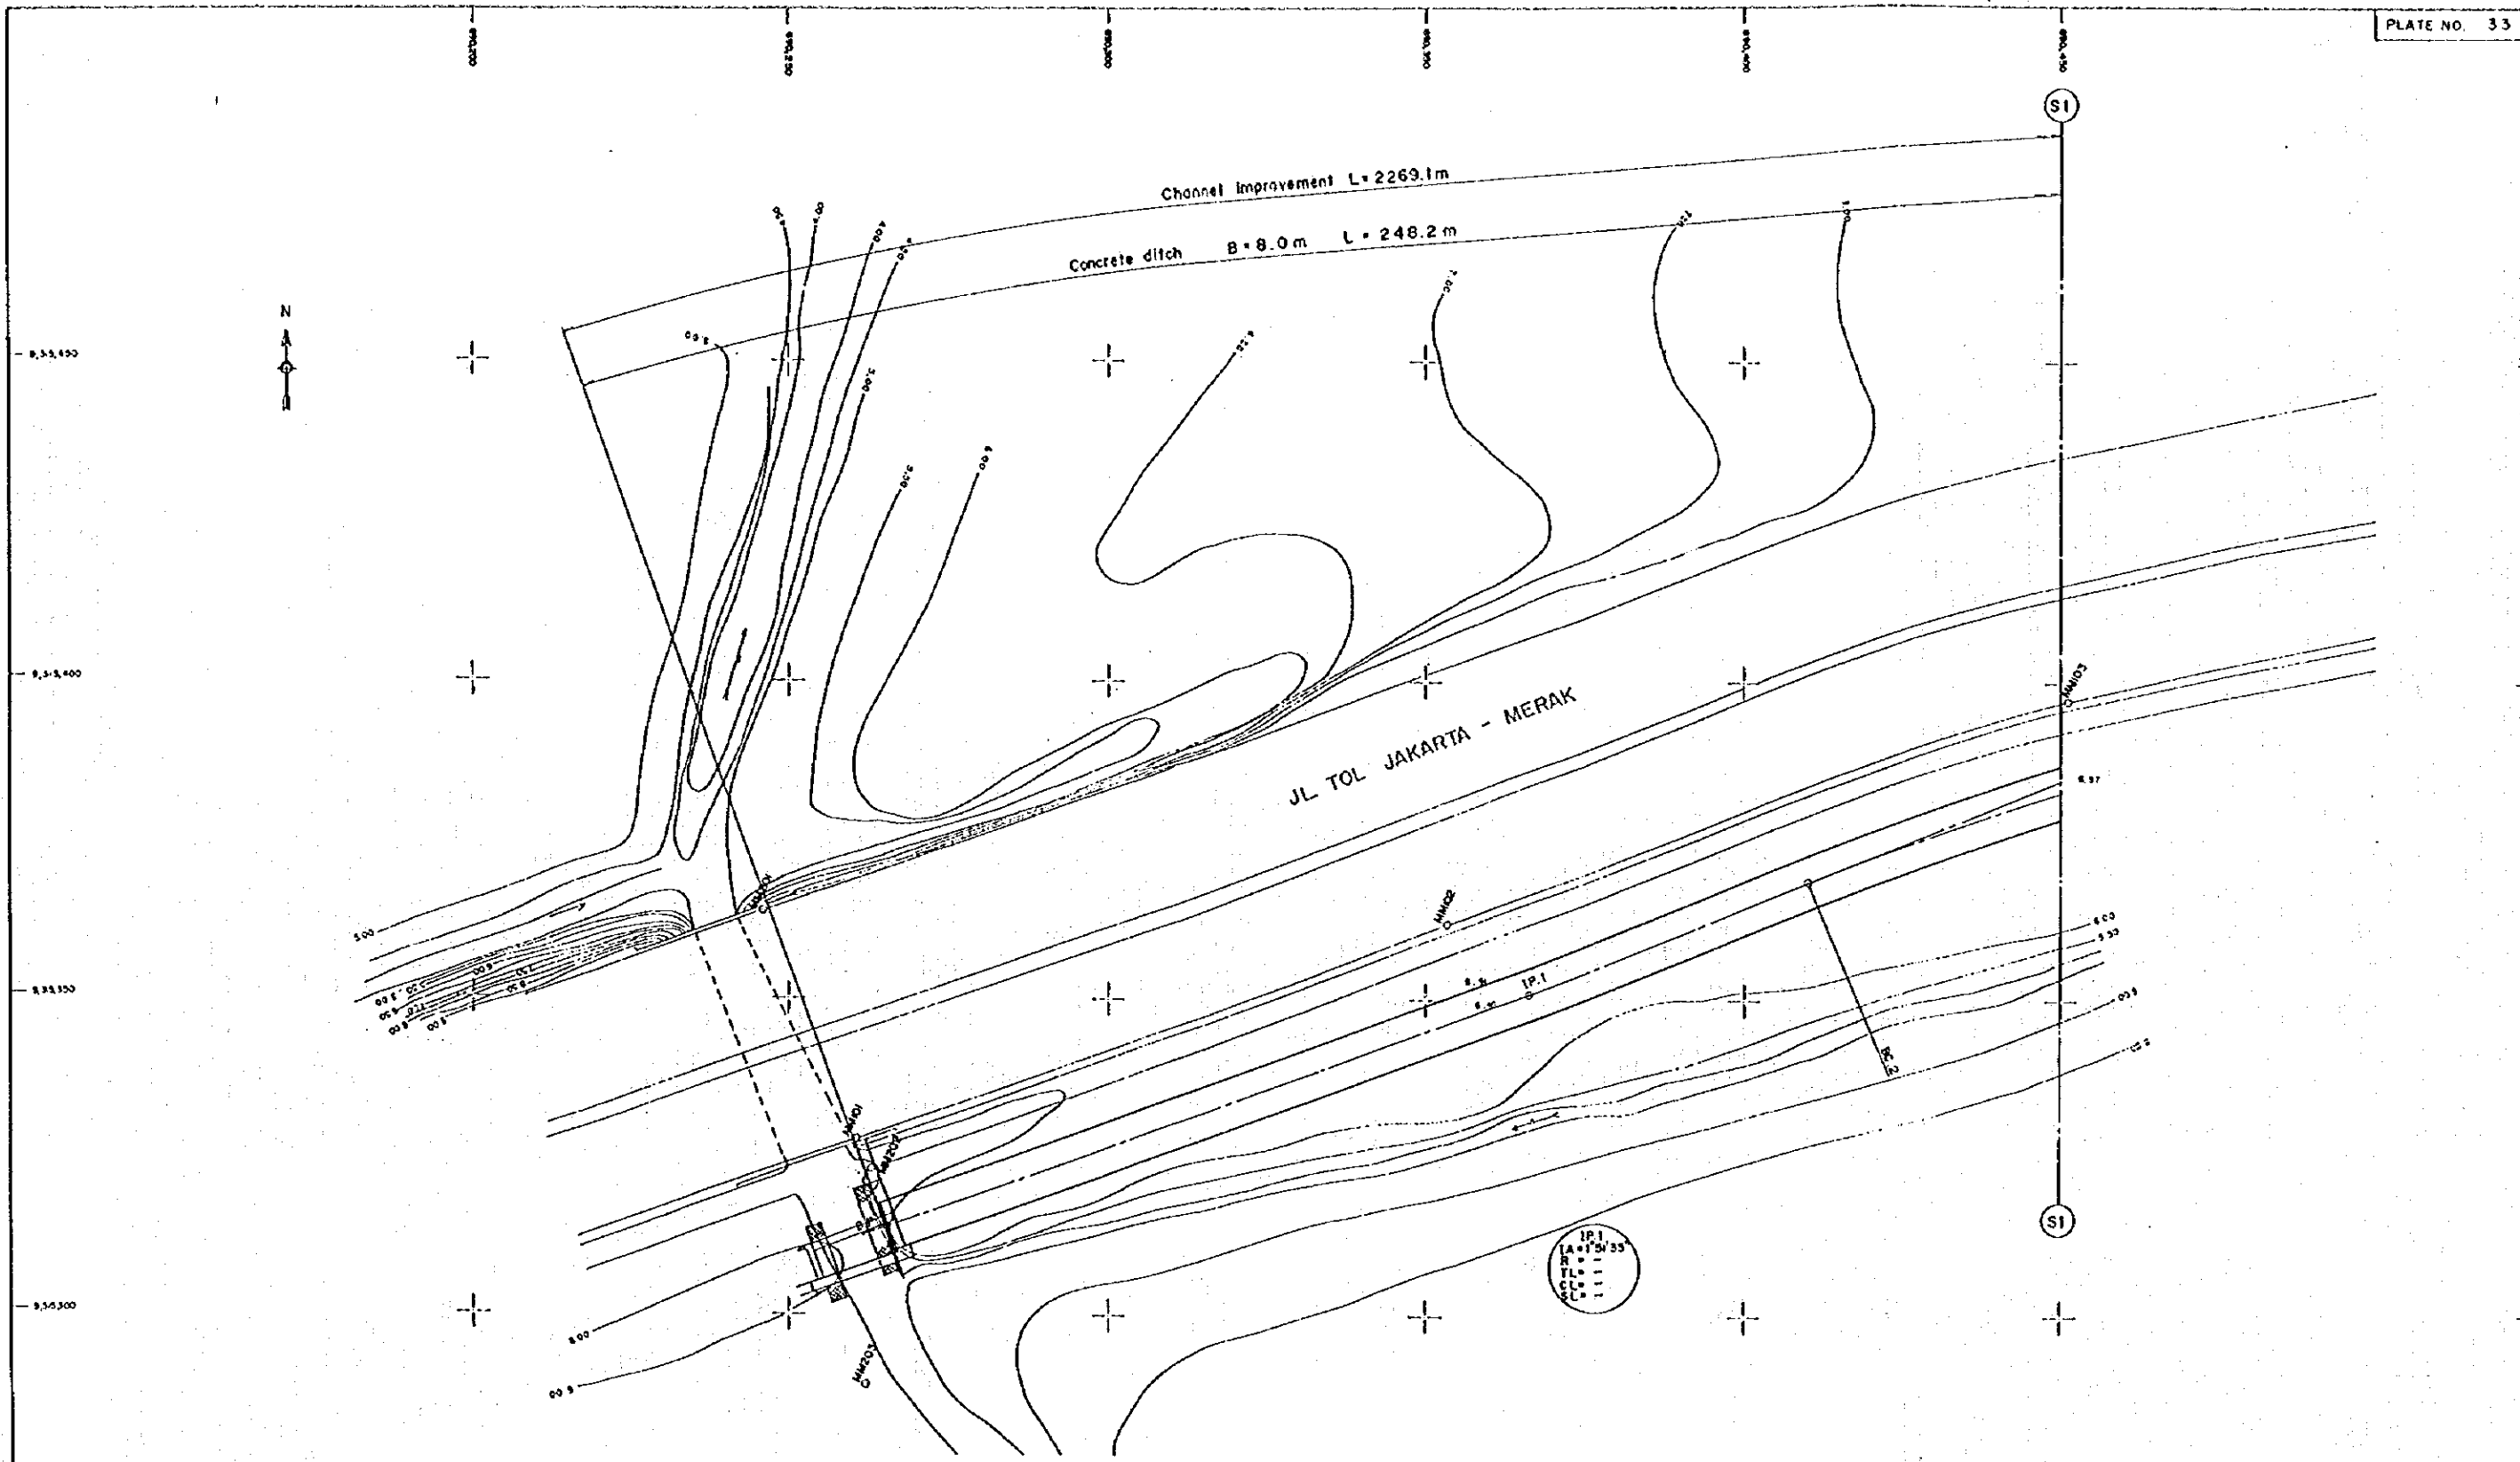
Plan of Saluran Cengkareng Drainage Channel (6)
